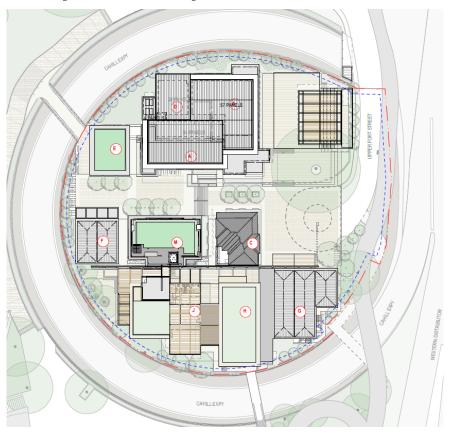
Site Plan- Proposed (Source: FJMT DWG DA-1211, 18.10.19)
